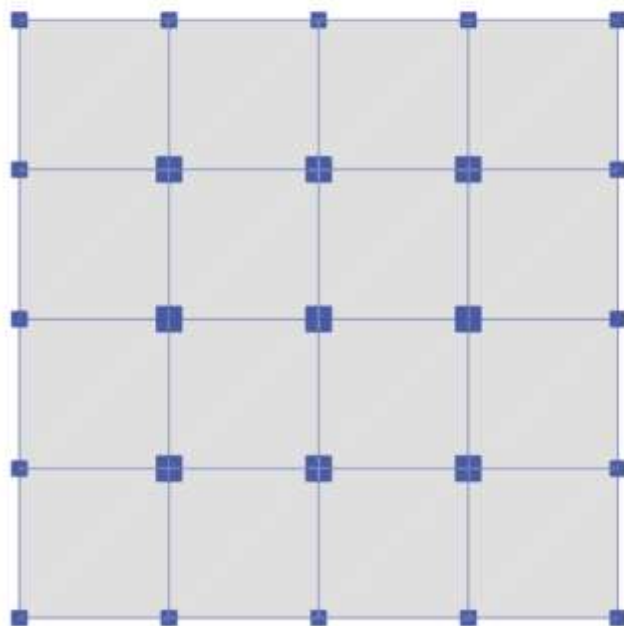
Model III: 20 storey Building with concrete filled columns at external face
